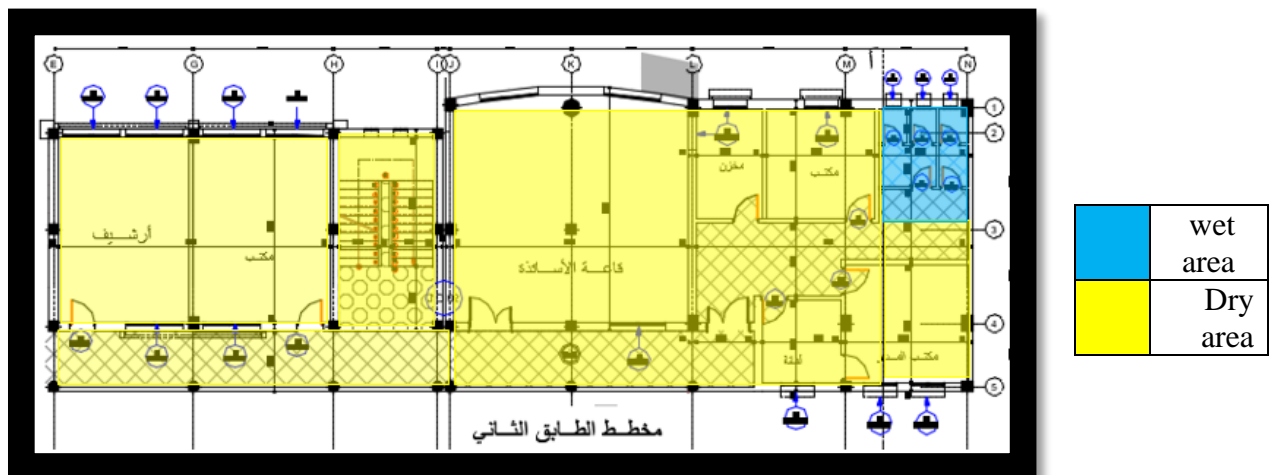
feild feature in the secnd floor ,Source:second floor plan adapted by the author 2025
